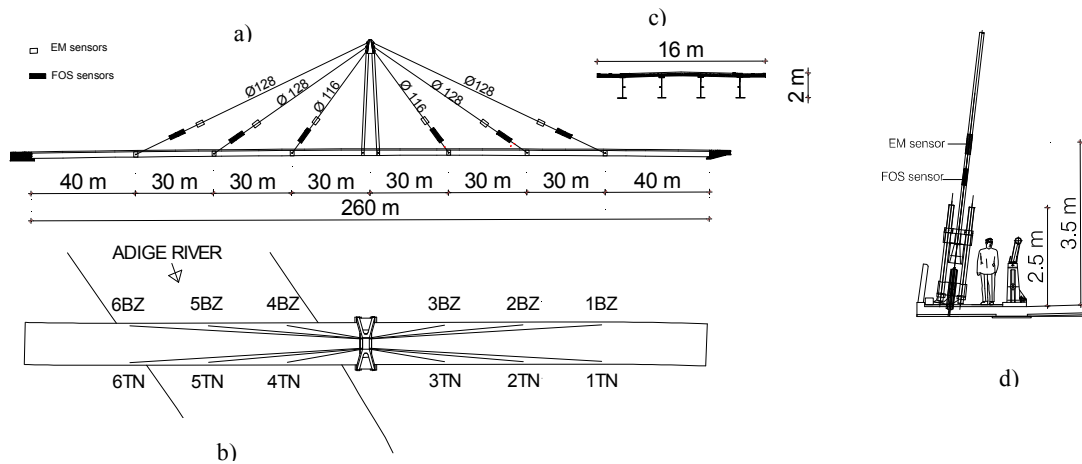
Elevation (a) plan view (b) and deck cross-section (c) of Adige Bridge; detail of sensors location on a cable (d).
